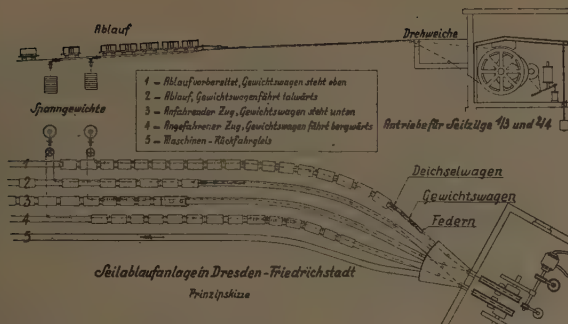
Rope shunting installation at Dresden-Friedrichstadt.
